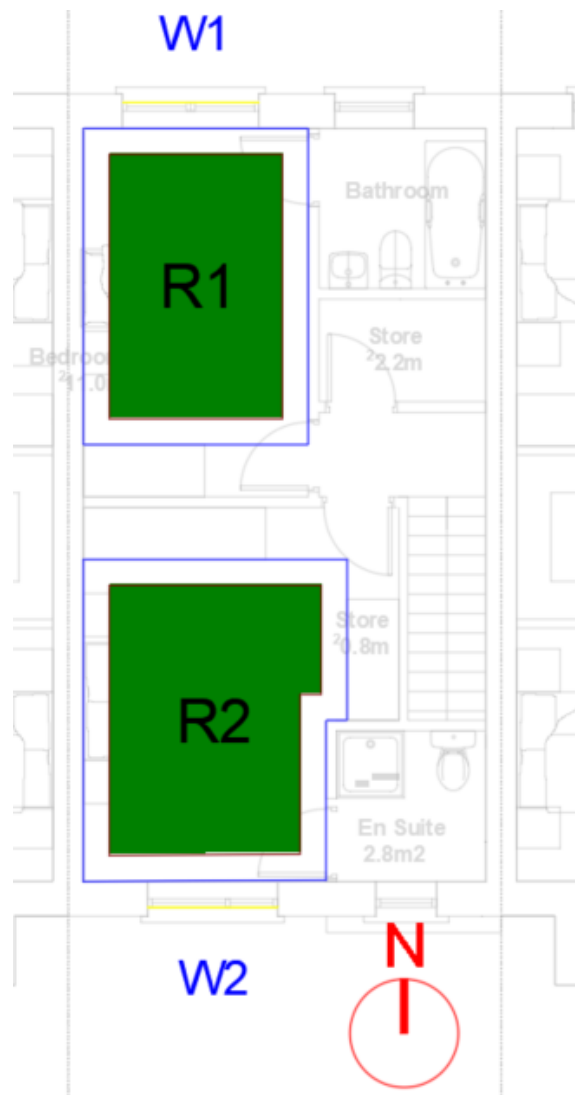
Proposed First Floor sDA Contours of House G-02 2-073
